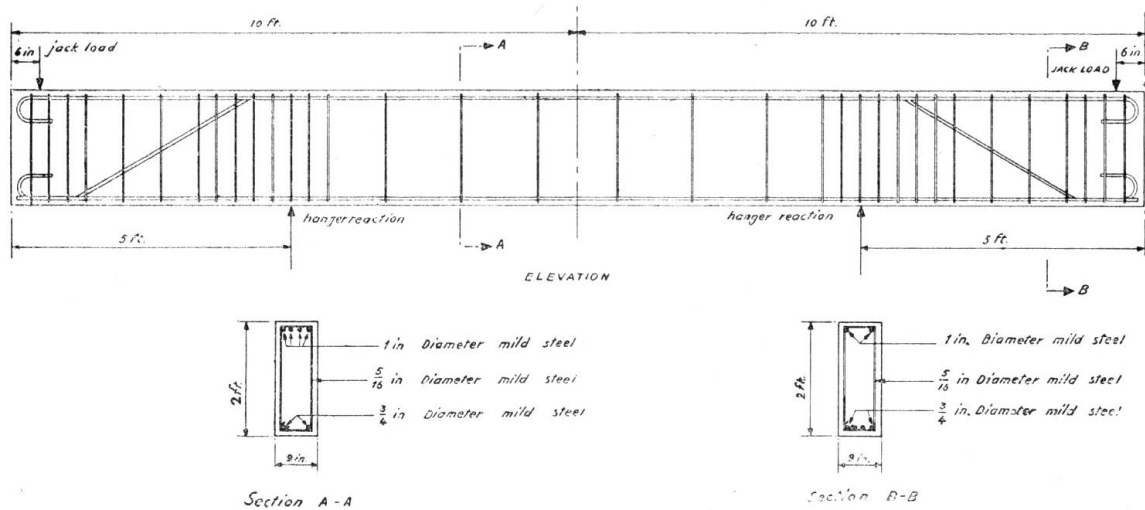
Dimensions and reinforcement of 20 ft beam with mild steel
